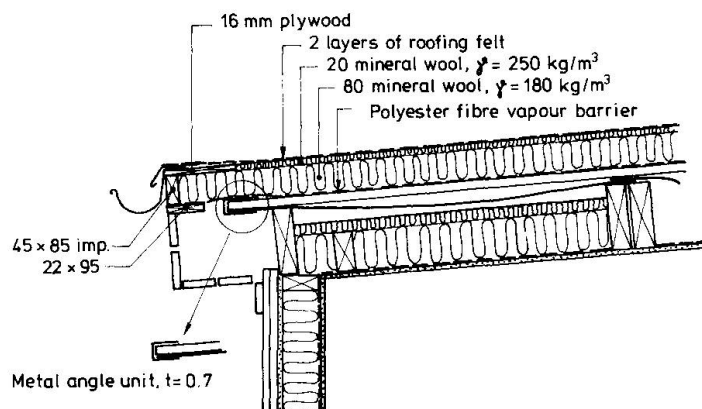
Rebuilt roof. The ventilation was closed off. As the joints in the metal sheeting were not tight, a sheet of roofing felt was laid on the metal as a vapour barrier. The additional insulation was nailed on.
